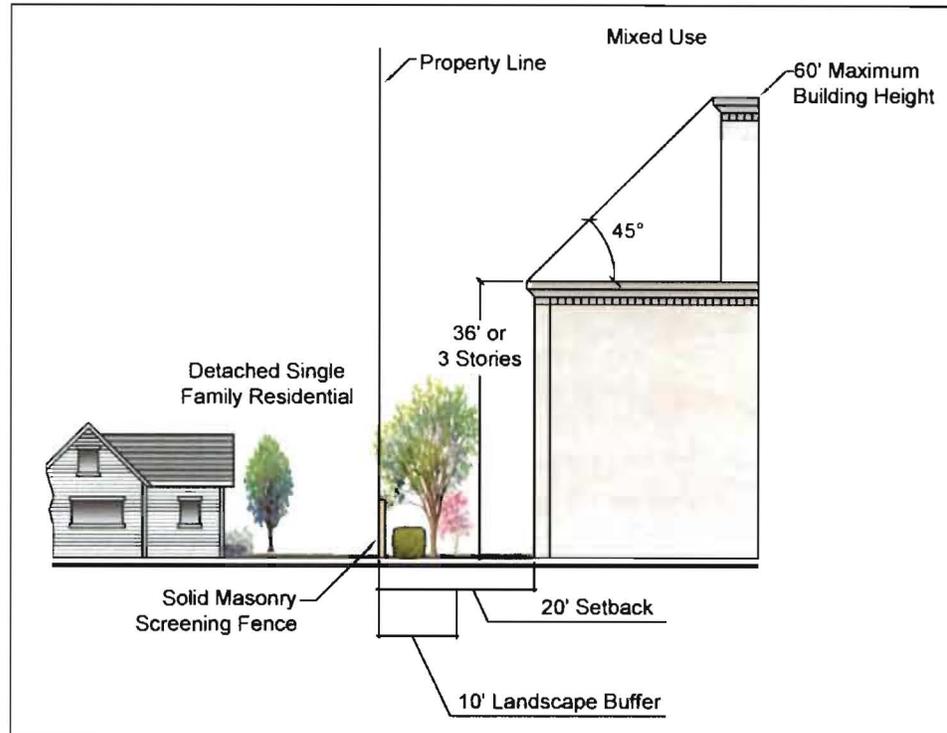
B-4 Example of Setback on Shallow Parcels Adjacent to Detached Single Family Zoned Residential Areas
